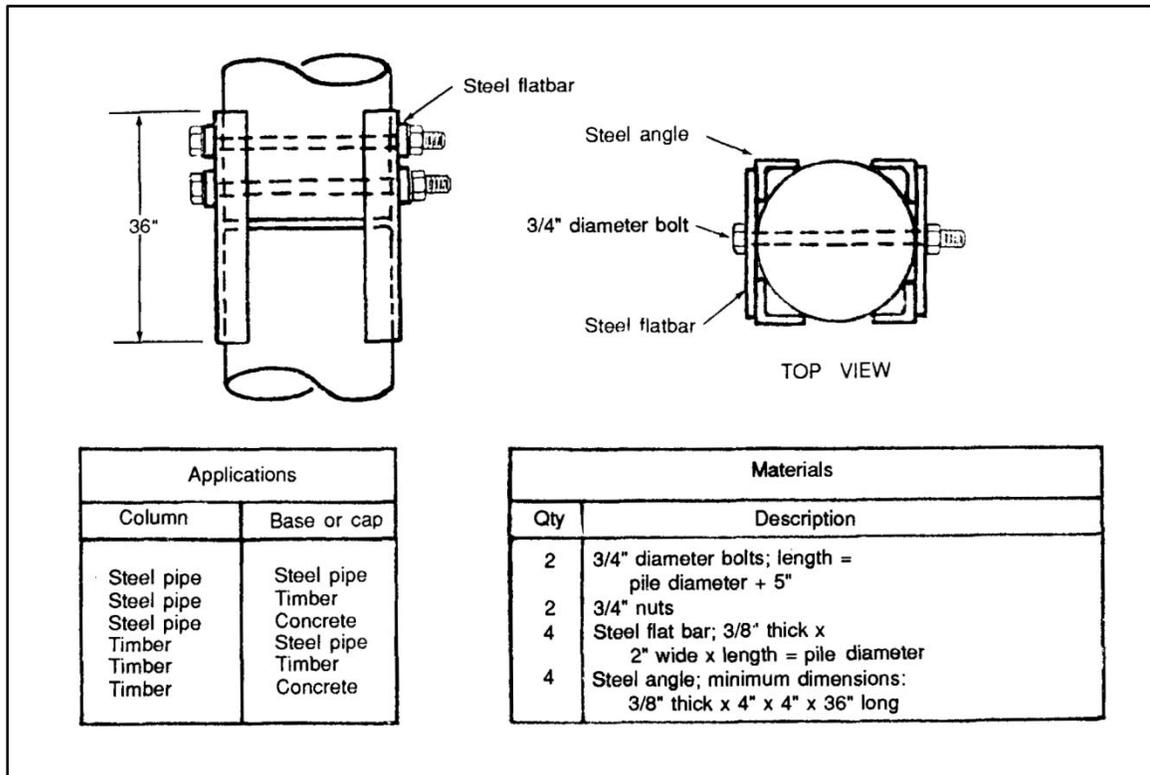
Joining like-diameter piles, column to base or cap connections (connecting method 3)
